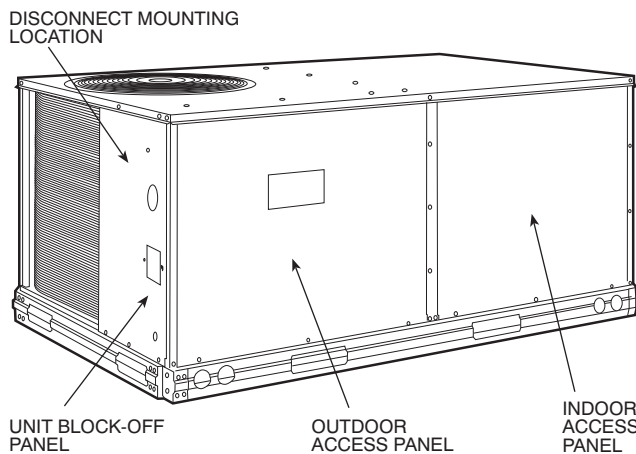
Typical Access Panel Location (3-6 Ton)
